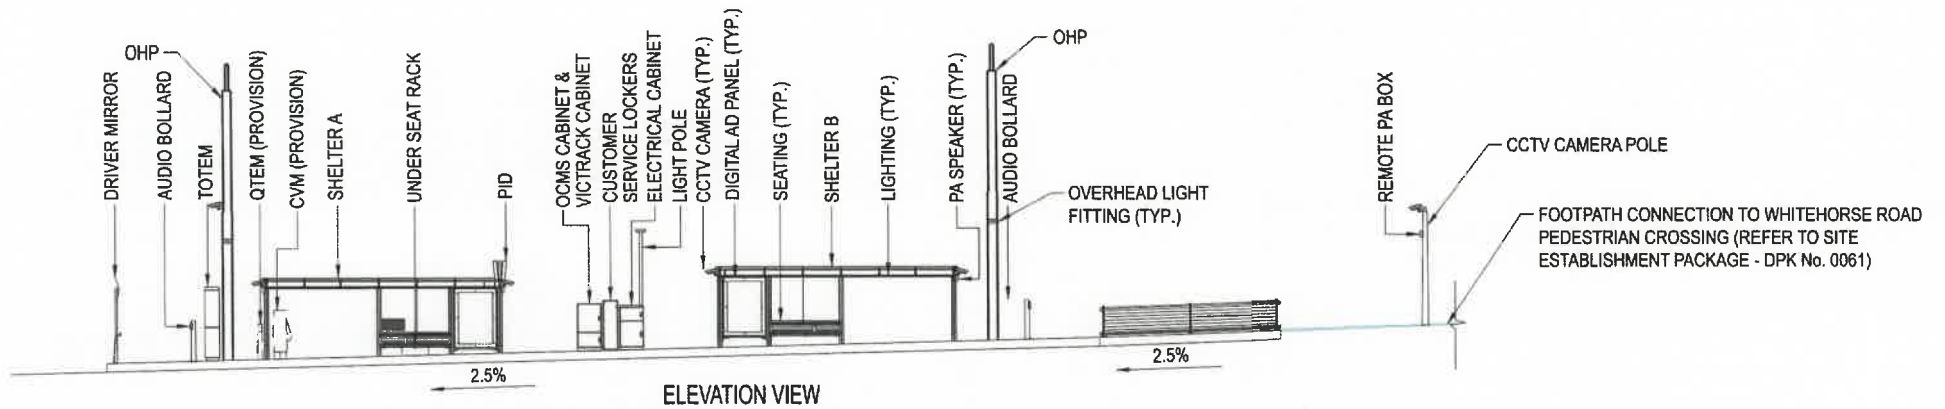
Excerpt from engineering drawings - east-west section through site, showing grade of pedestrian ramp and location of key infrastructure.
